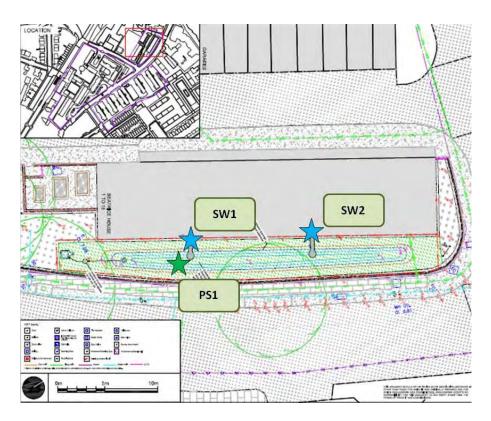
Location of Leveloggers and v-notch weirs (blue stars) and buried levelogger (green star) on the downpipes and in the swale of Beatrice House at Queen Caroline Estate, London Borough of Hammersmith & Fulham.
